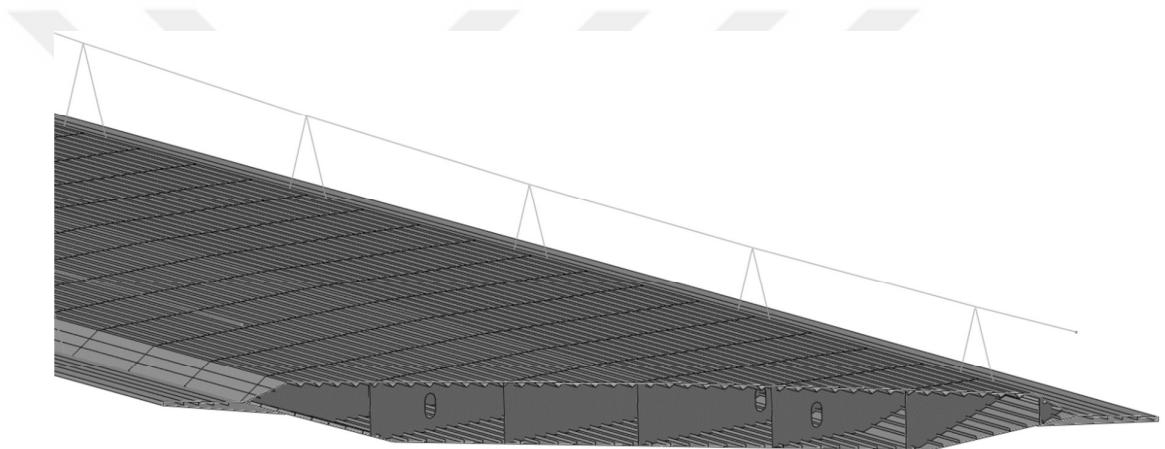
Transverse diaphragms and longitudinal stiffeners are shown in a section of the deck model
